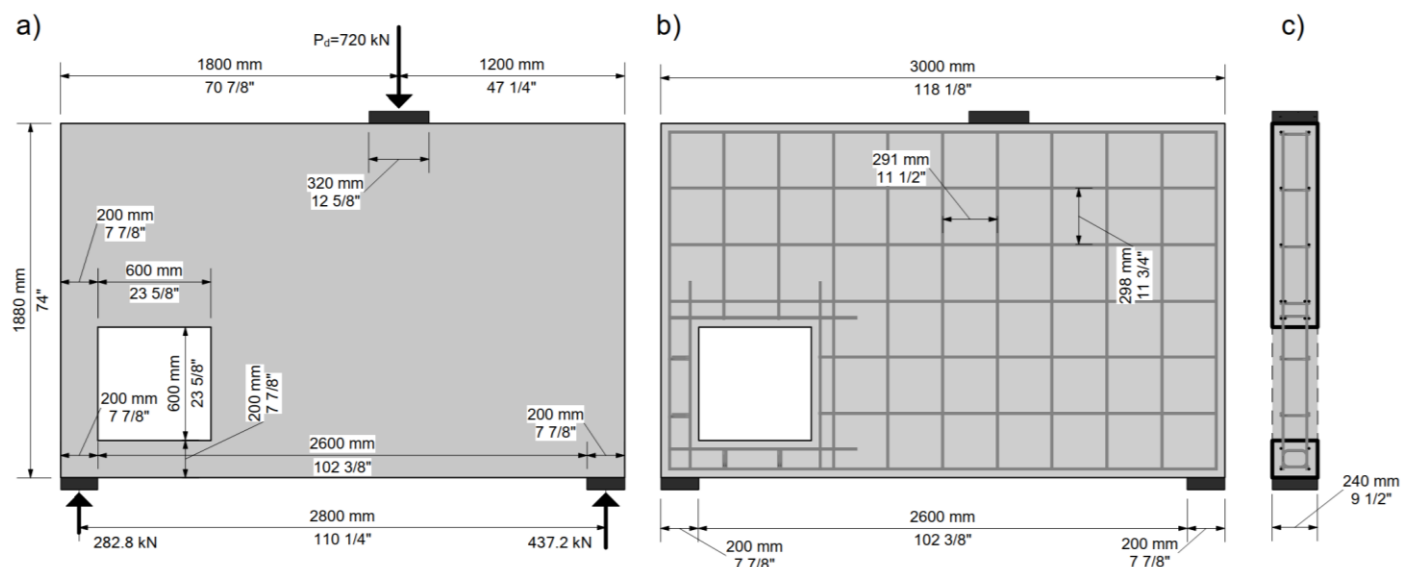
Deep beam with a large hole a) elevation: overall dimensions, boundary conditions, and load scheme b) elevation: minimum distributed reinforcement layout c) cross-section: minimum distributed reinforcement layout.
